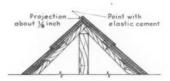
DETAIL OF UNIT ROOFING - SHINGLE TYPE
